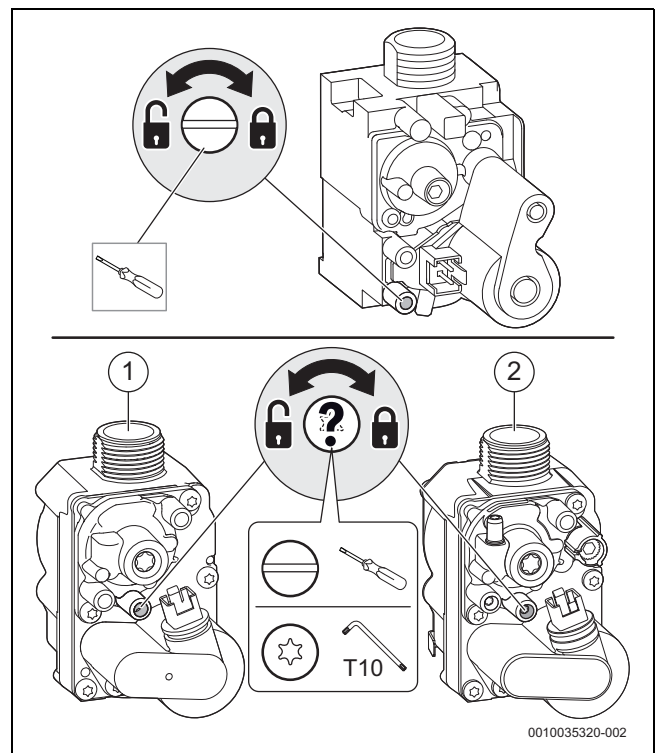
Checking the gas supply pressure (above: SIT valve, below: Resideo valves)
